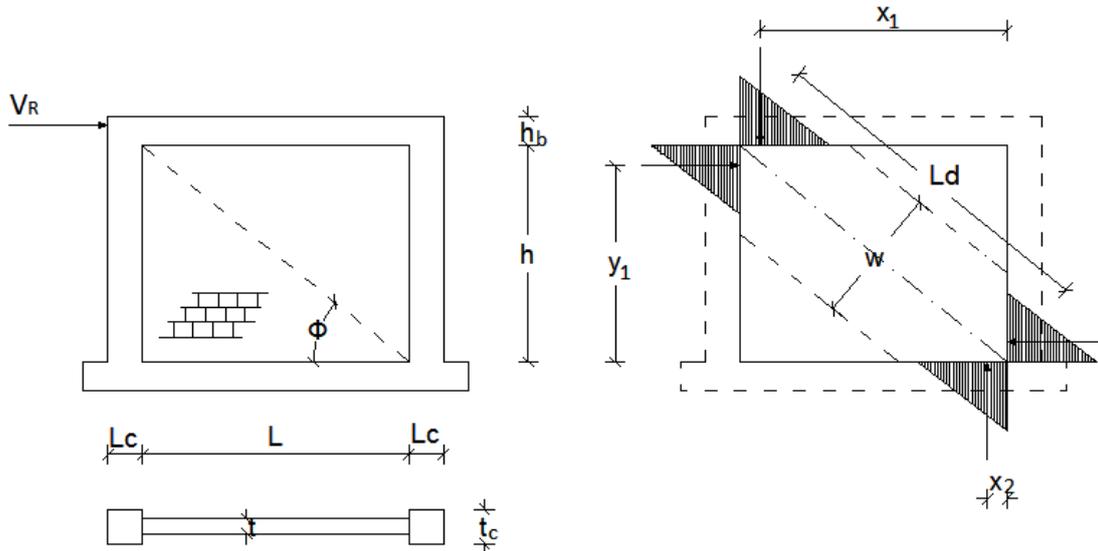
model of masonry infilled frame and idealized stresses in the corners of compression strut
